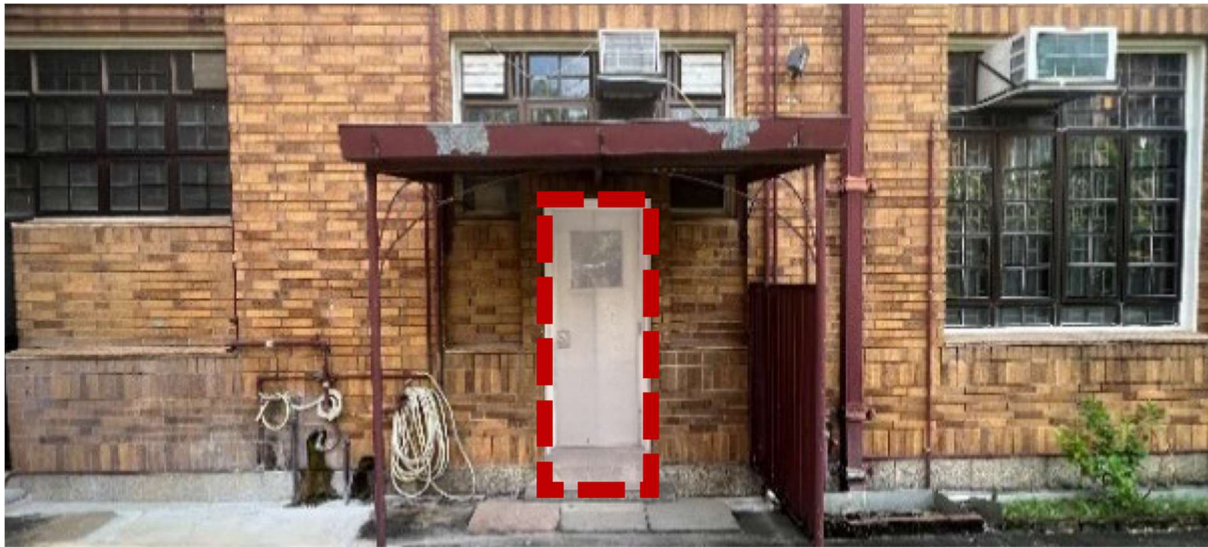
Extent of Proposed Widened Door Opening (red dashed line)
